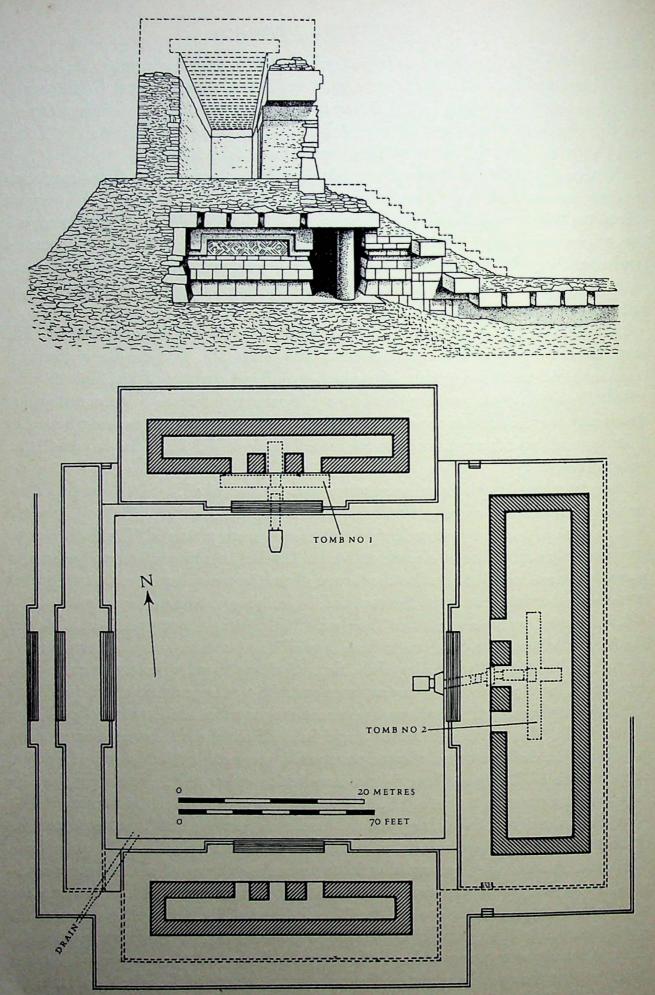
Mitla, Quadrangle F, tombs, ninth century (?). Section of north building and plan of court
